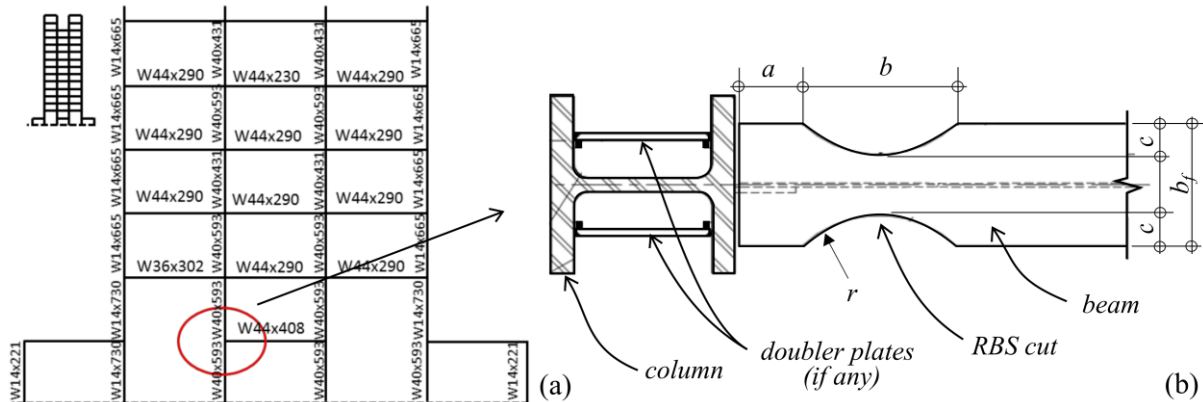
a) Sections at the lower storeys of the Case study building, b) Plan detail of the examined beam-column connections with doubler plates.
